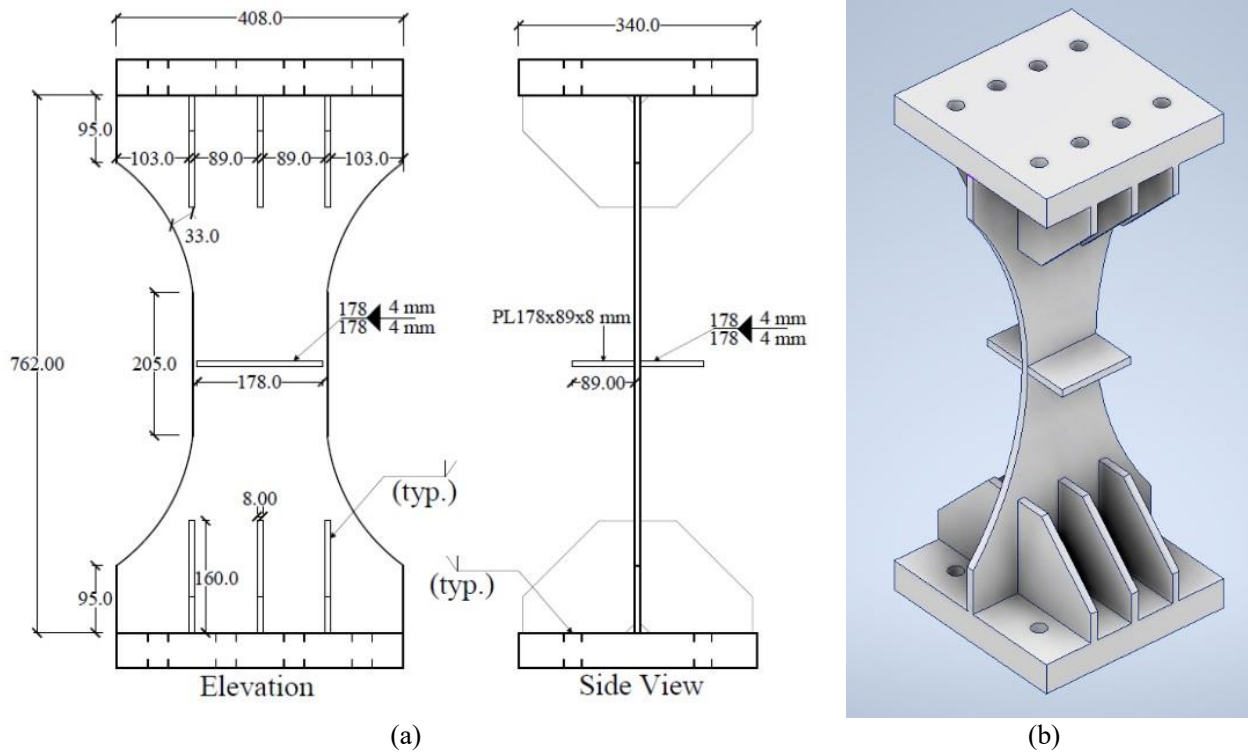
General layout of the transverse stiffener specimen (a) dimensions (in millimeters) and (b) 3D render of the T specimen.
